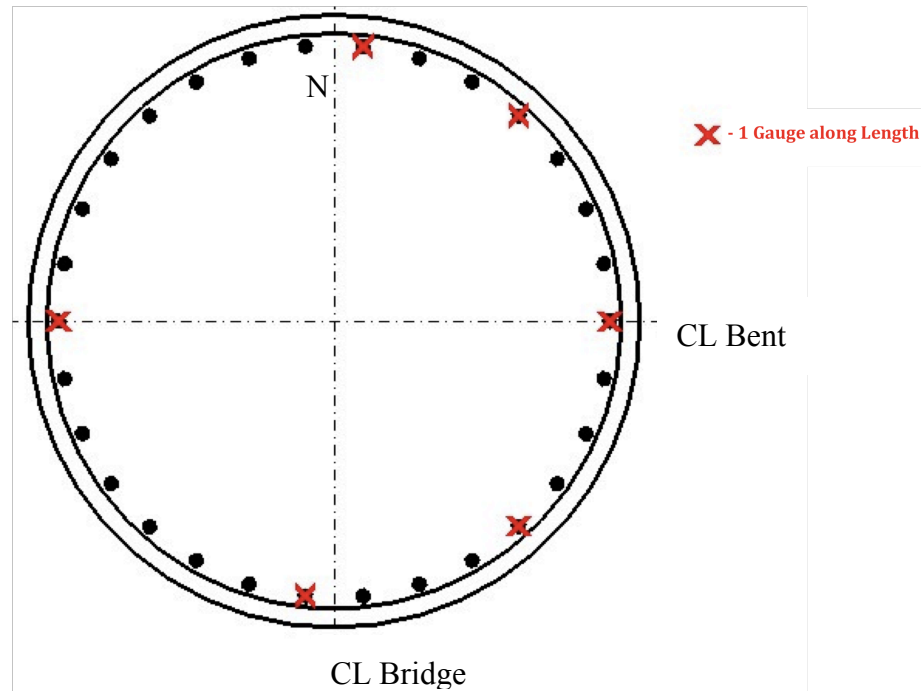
Bottom of Column Longitudinal Reinforcement Gauges
